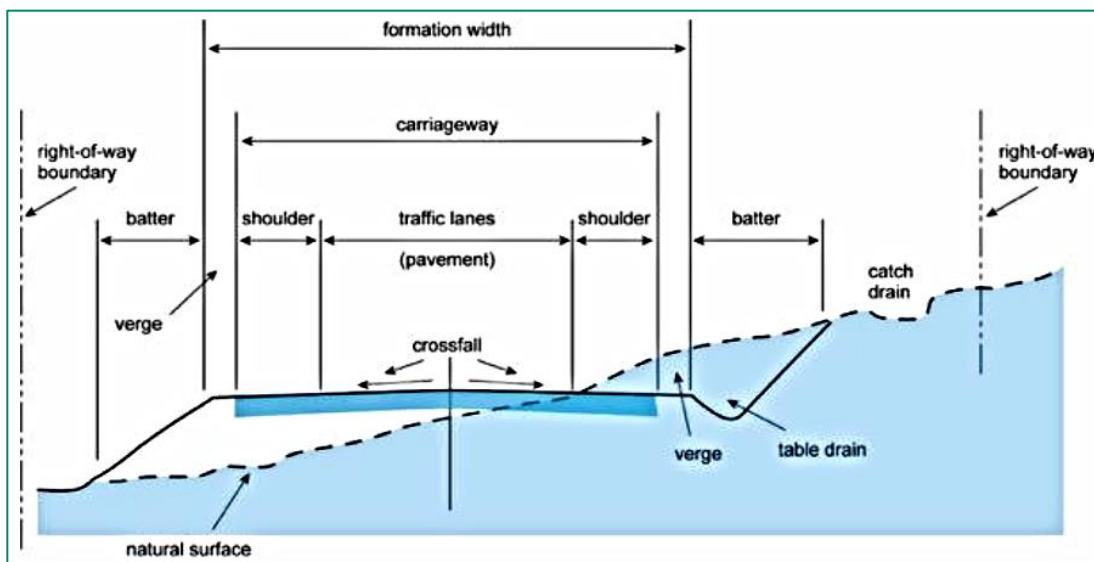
Elements of a road cross-section (source: Austroads 2016c – Figure C25 of *ARRB Unsealed Roads Best Practice Guide Edition 2*)
